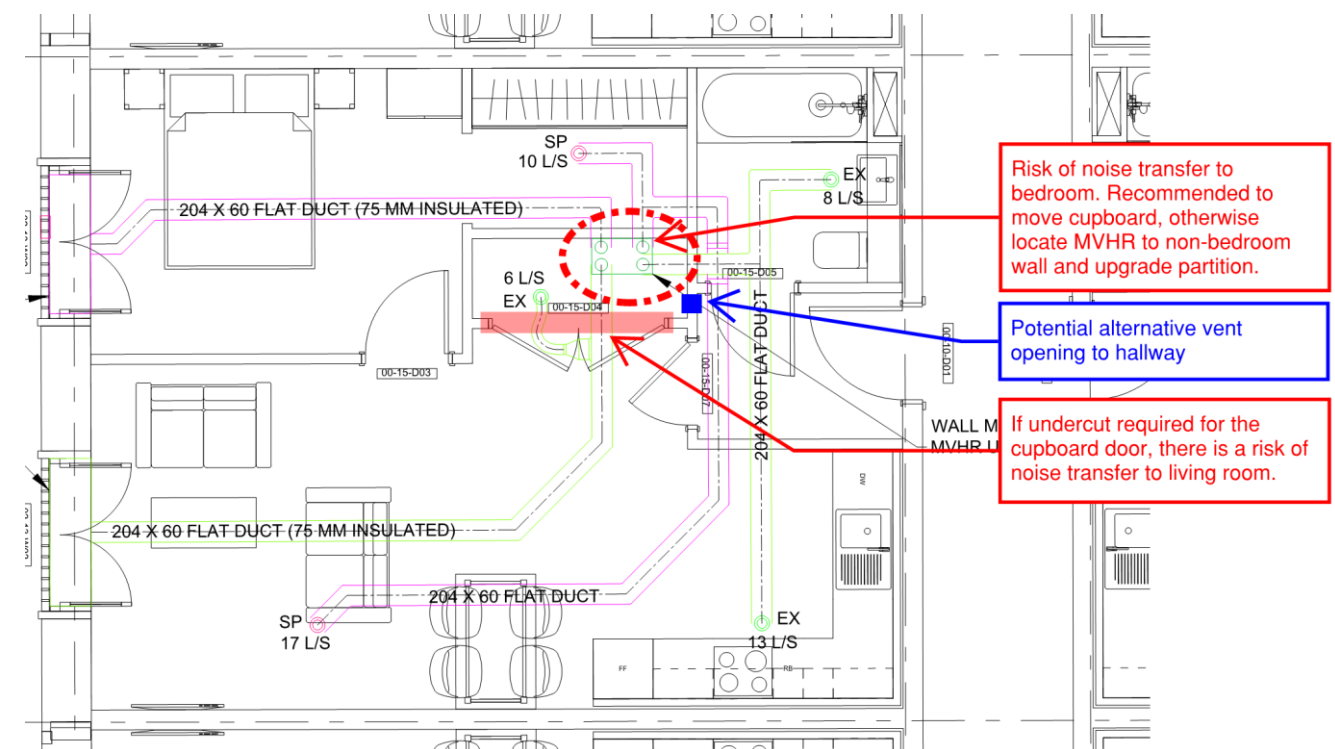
Comments to building services layouts - MVHR cupboard door
